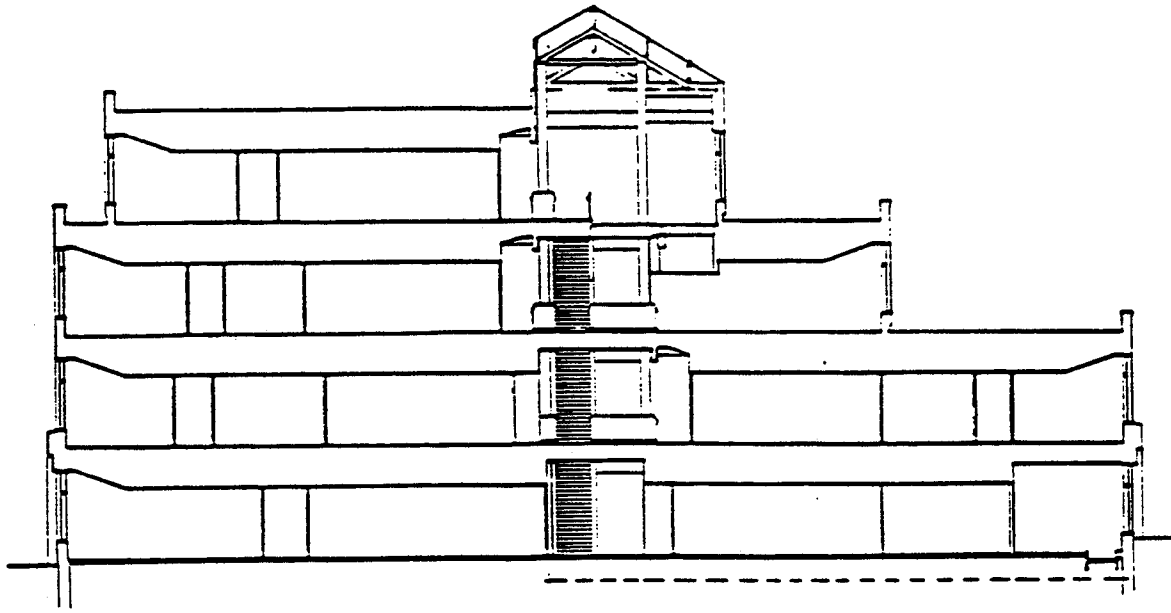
Section through the east block of the Professional Faculties Building, showing one of the light wells.
